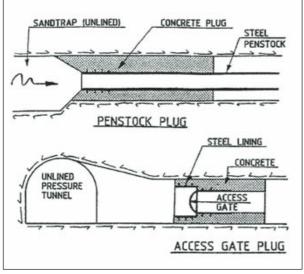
General layout of penstock plug and access gate plug (from Bergh-Christensen 1988).
